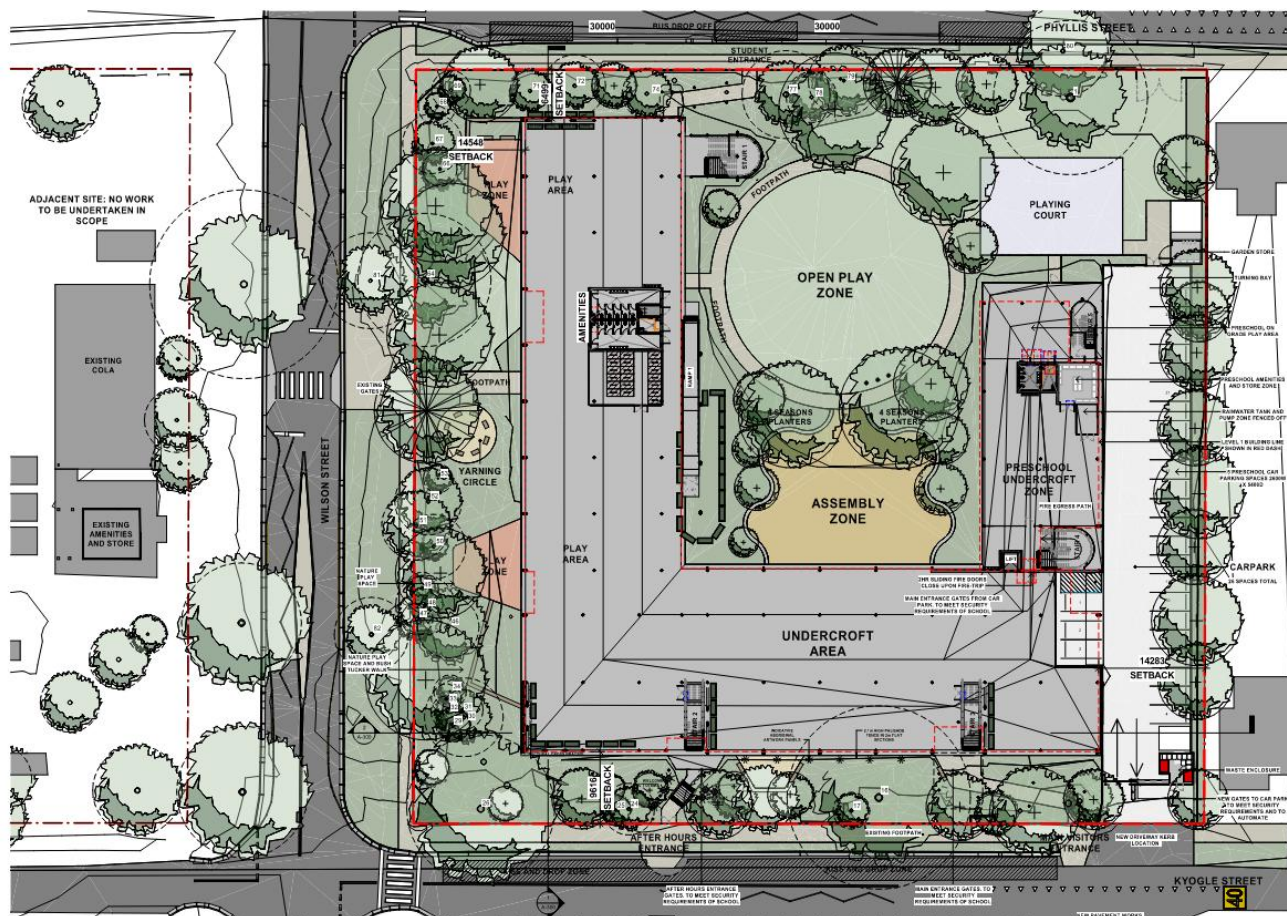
Proposed Site Plan- Ground Level (Source: EJE Architecture)
